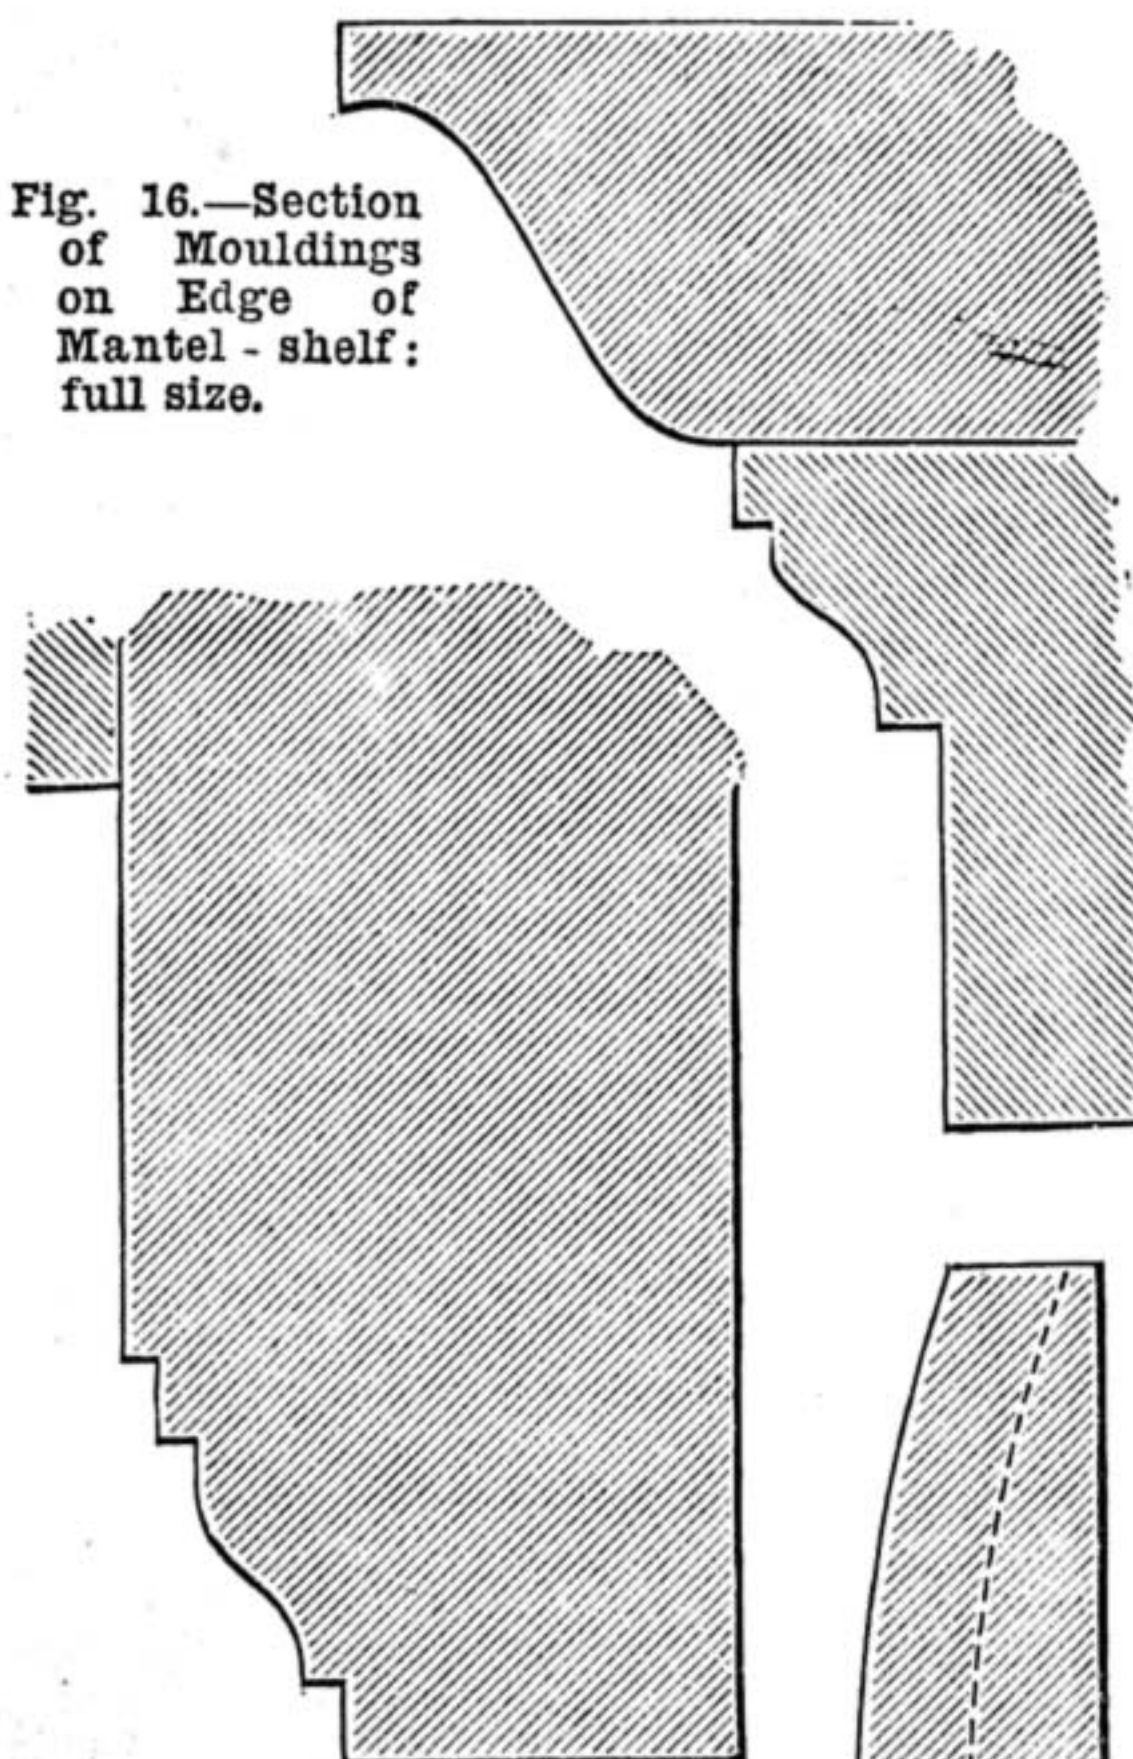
Section of Mouldings on Edge of Mantel - shelf: full size.
